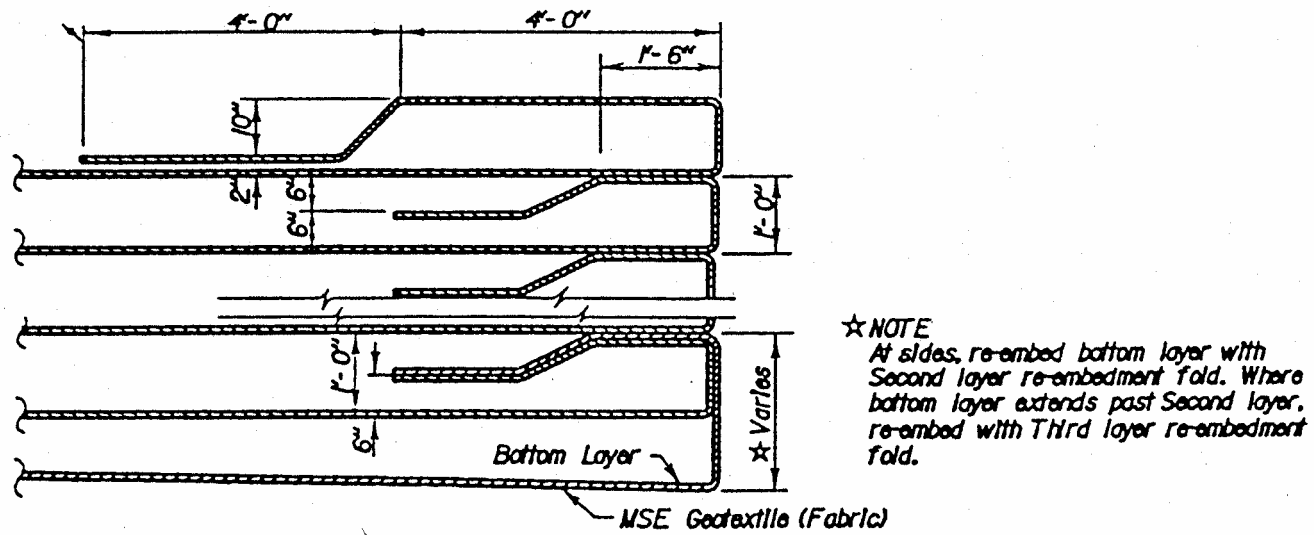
Design detail as of 1999 of a typical side wrap section of the geotextile reinforced soil wall
